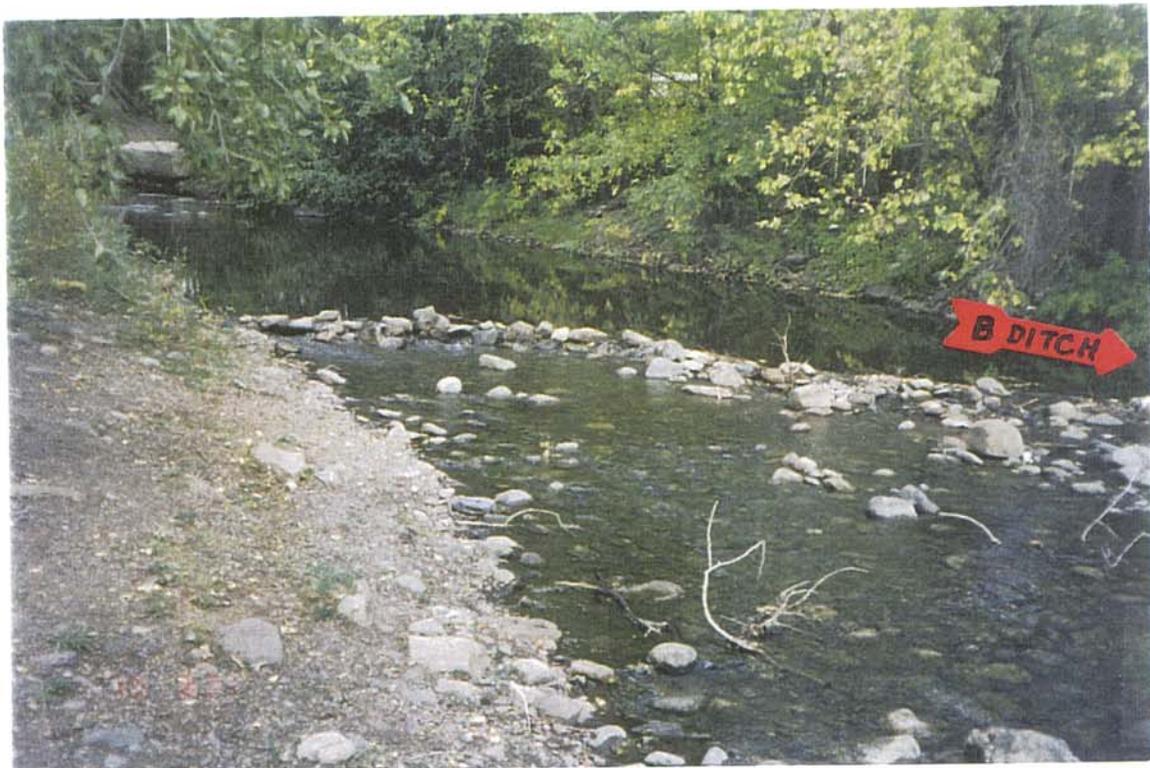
"B" Ditch (Taos Pueblo) - Looking upstream at a rock and brush diversion structure on Rio Pueblo de Taos. Side channel to "B" ditch is shown by arrow. Structure frequently washes out and must be rebuilt each time.
